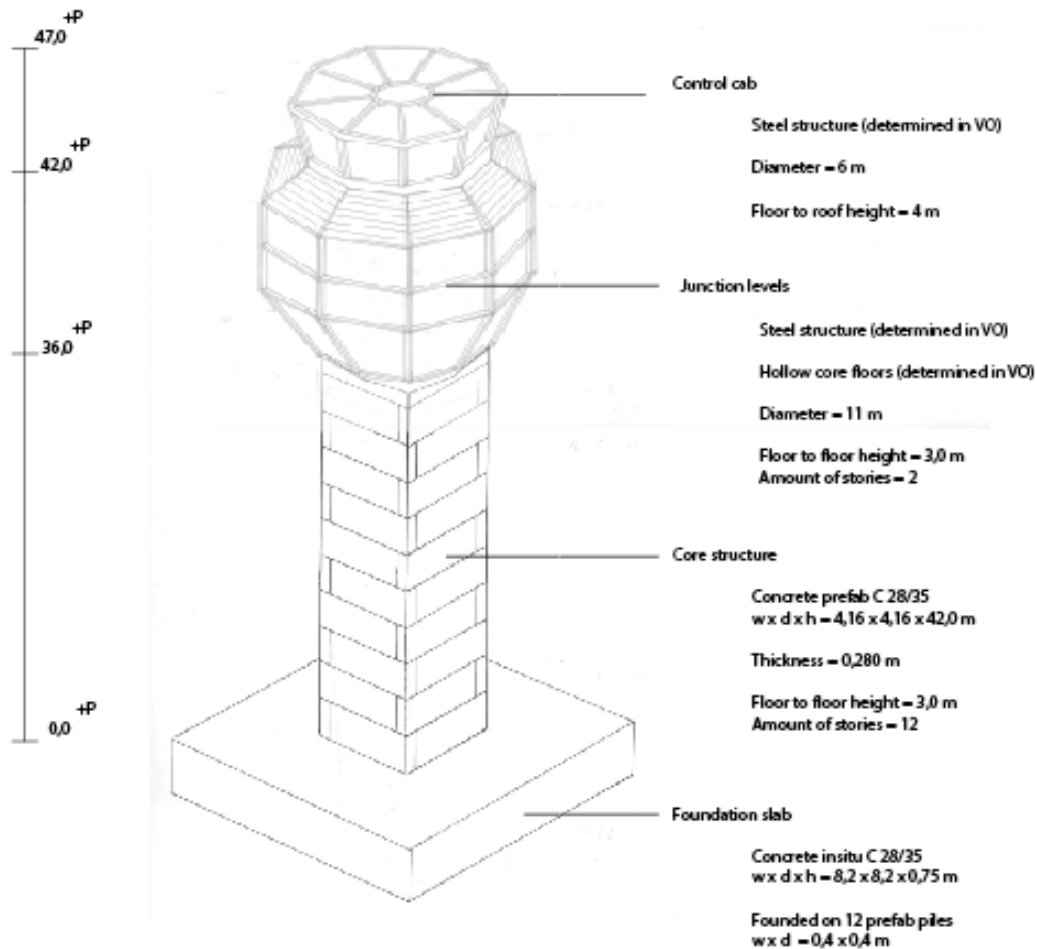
Concept design Lelystad airport, concrete core prefab
